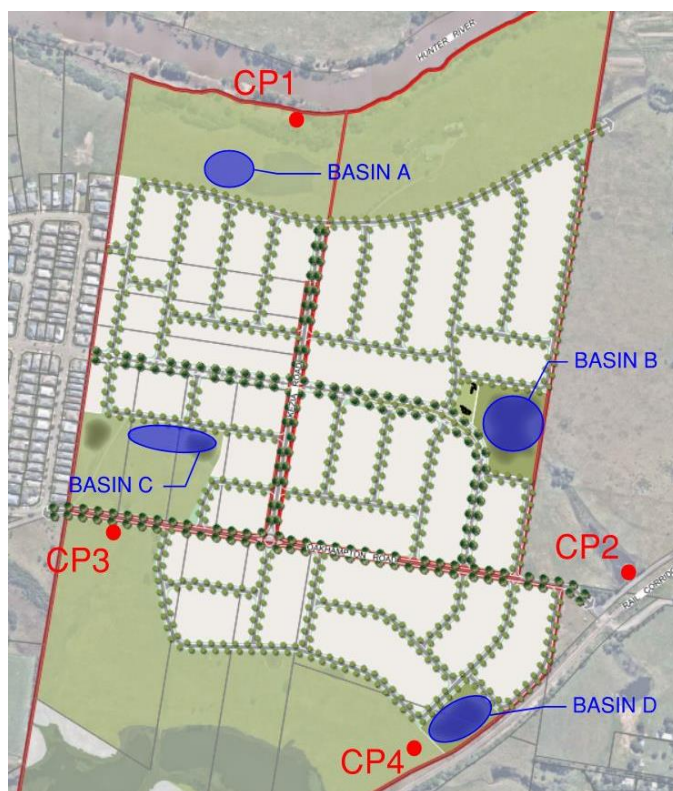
Proposed On-Site Stormwater Detention Basin Locations
